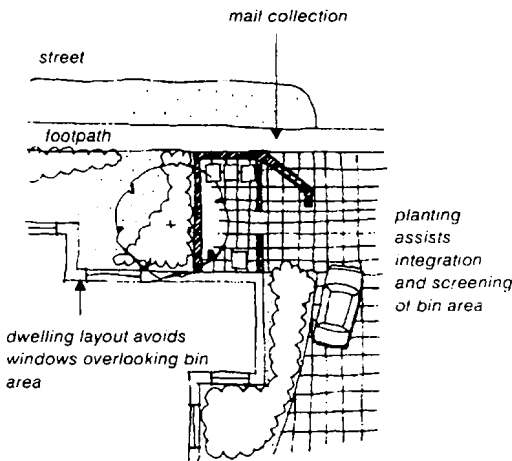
Site facilities, such as mailboxes and garbage areas, should be convenient to use and integrated into the development so as not to detract from the streetscape.
